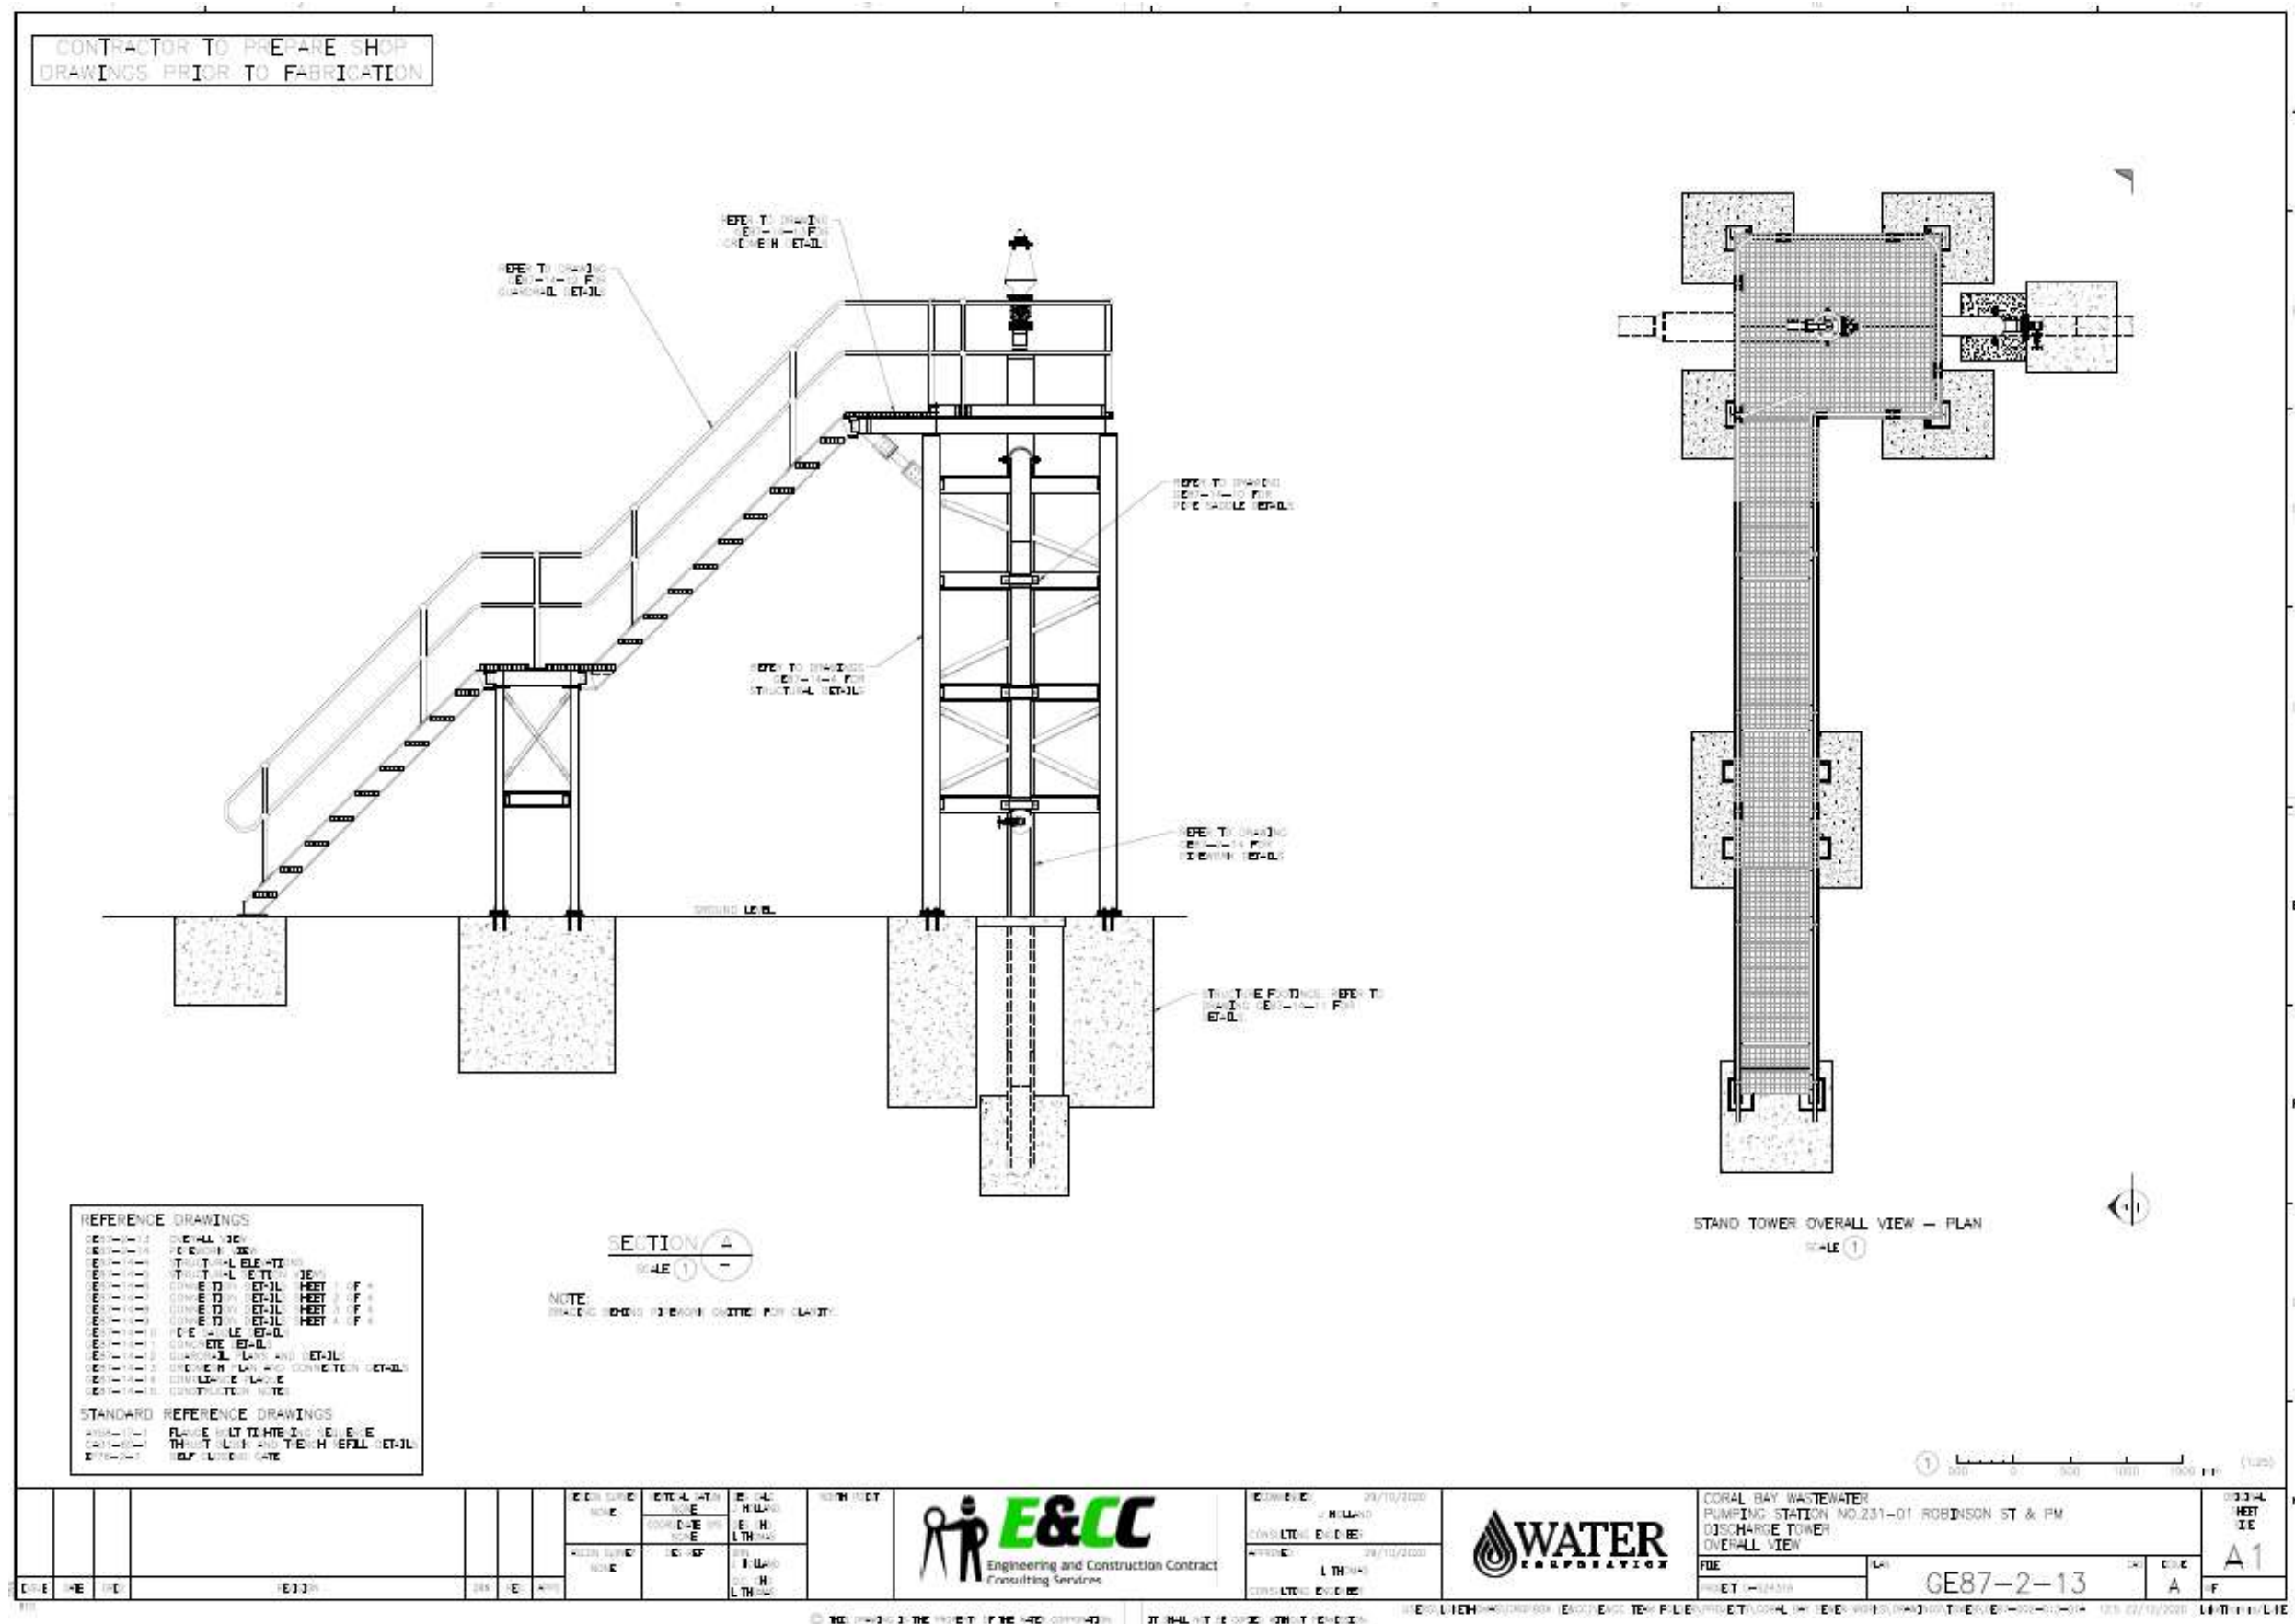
Coral Bay Wastewater Treatment Plant discharge tower installation – plan GE87-2-13
